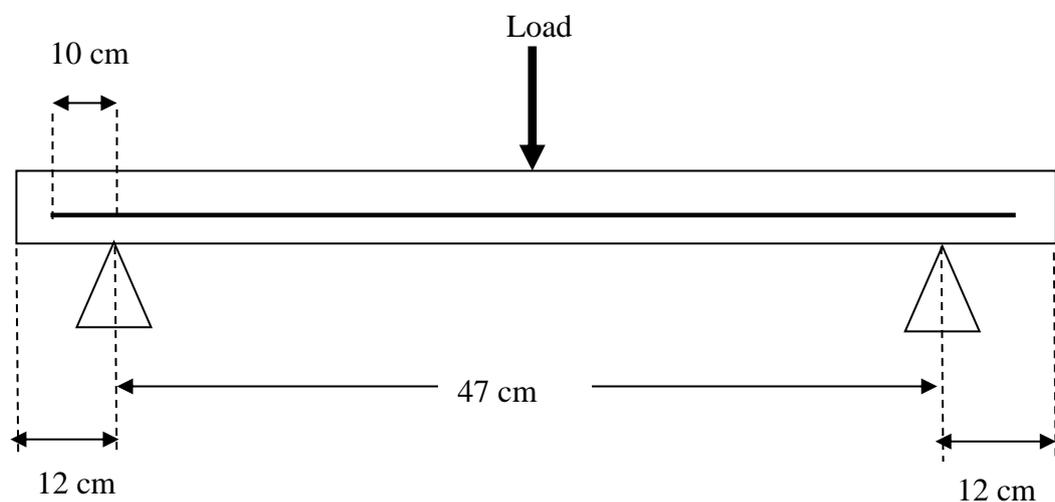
Three-point beam diagram for the flexural test setup; the vertical position of the reinforcing rod is out of scale
